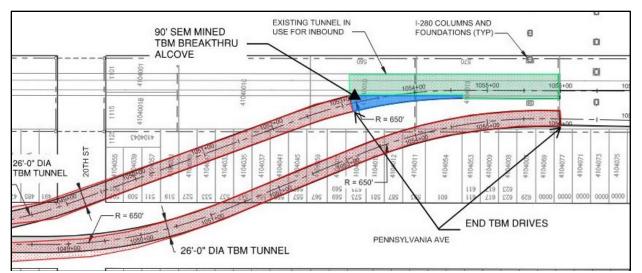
Plan and Profile of the Twin TBM Bored Tunnel Connections to Existing Caltrain Tracks for Alternative B2
